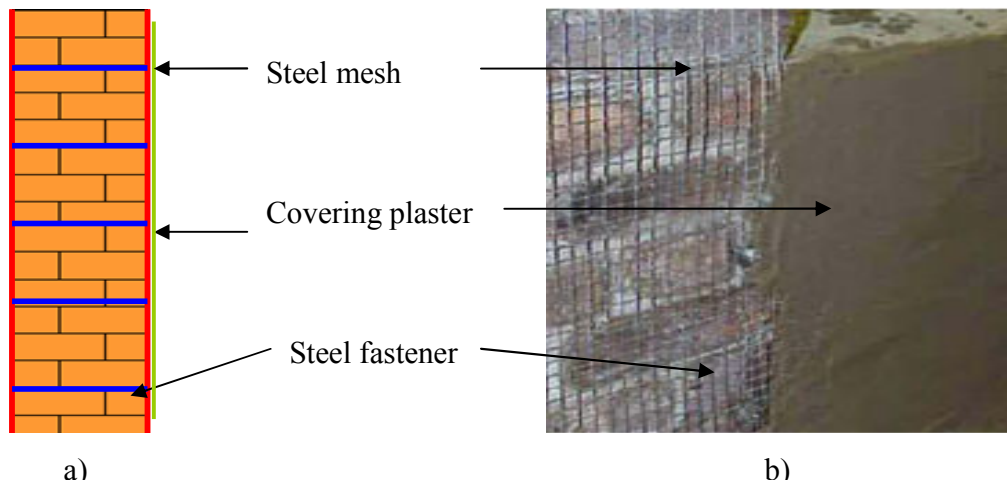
Application of steel wire meshes; a) wall cross section steel fastener, b) Steel wire mesh in vertical wall and plaster
